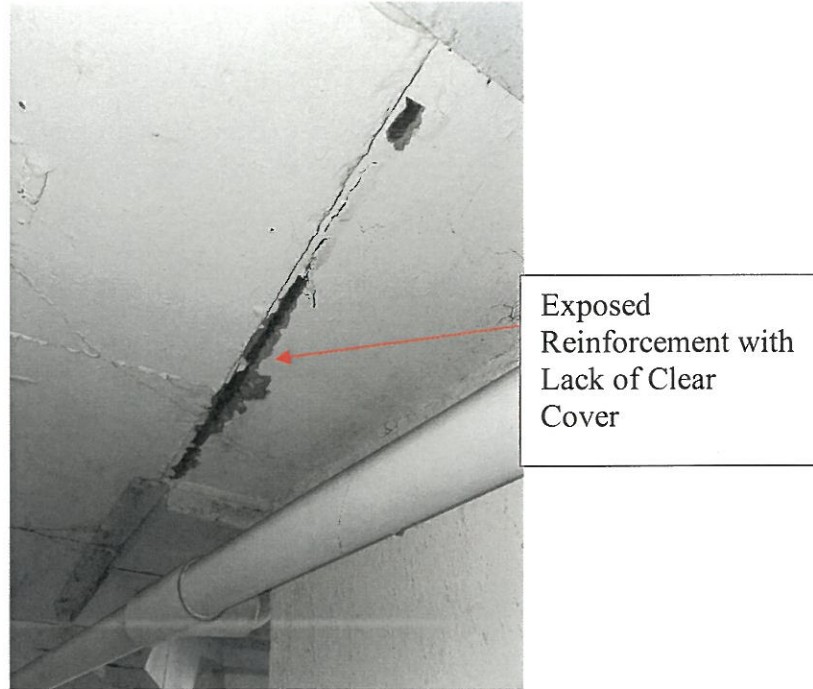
Exposed Reinforcement and Cracks on Garage Structure Side of Expansion Joint
